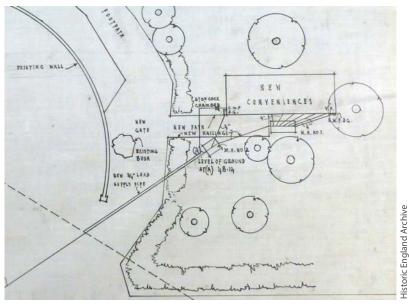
LCC plan for 'new ladies' convenience', 1937. This block is located to the west of Marble Hill House
